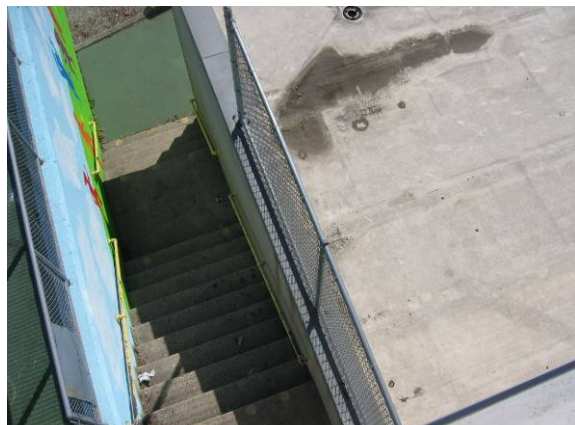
Management reported that vandals have accessed the lower kindergarten roof via this stair wall
